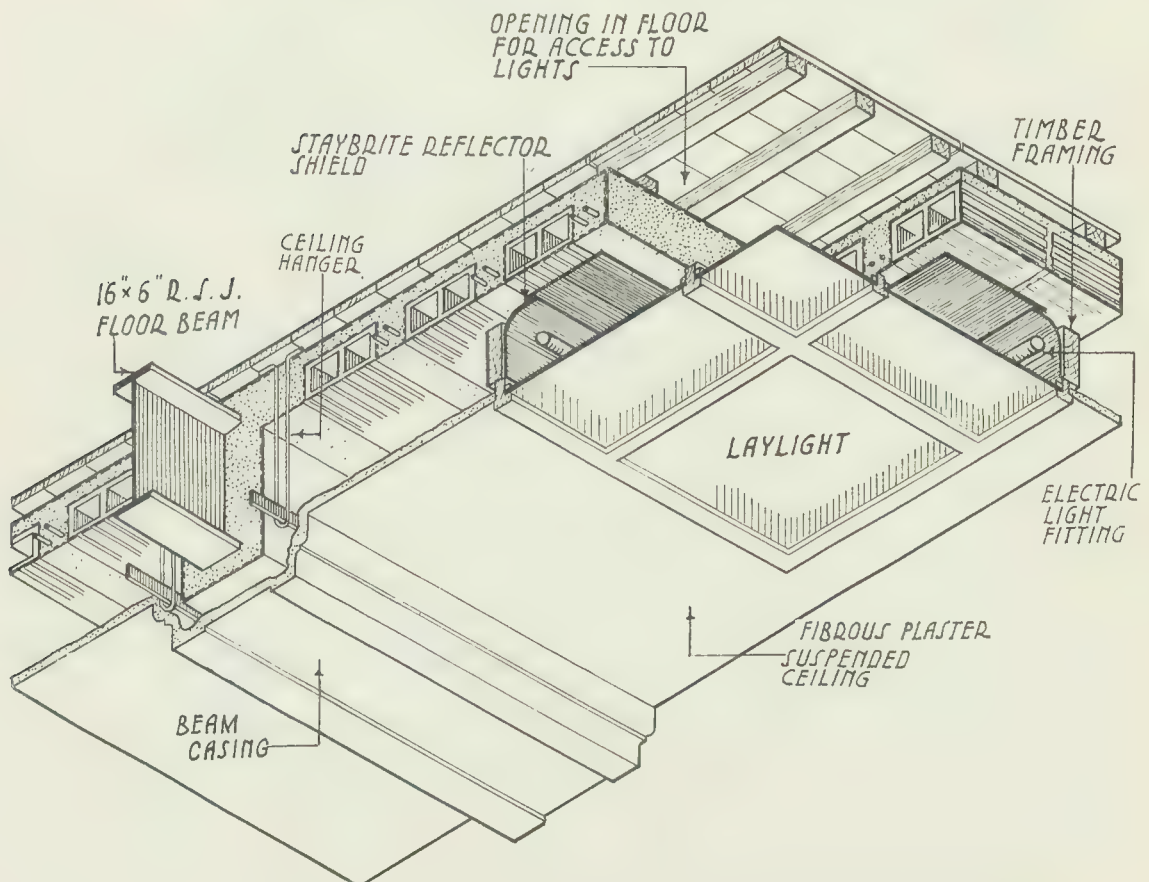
CONSTRUCTION OF LAYLIGHT AS PART OF A SUSPENDED CEILING
